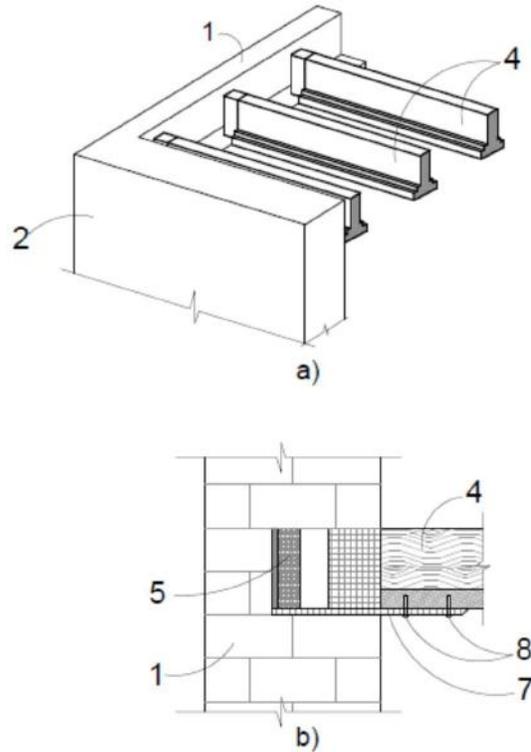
Wall-to-floor connection (1 - external load-bearing wall; 2 - external non-load-bearing wall; 3 - internal non-load-bearing wall; 4 - wooden beam; 5 - thermowell; 6 - waterproofing; 7 - anchor of strip steel; 8 - nails).
